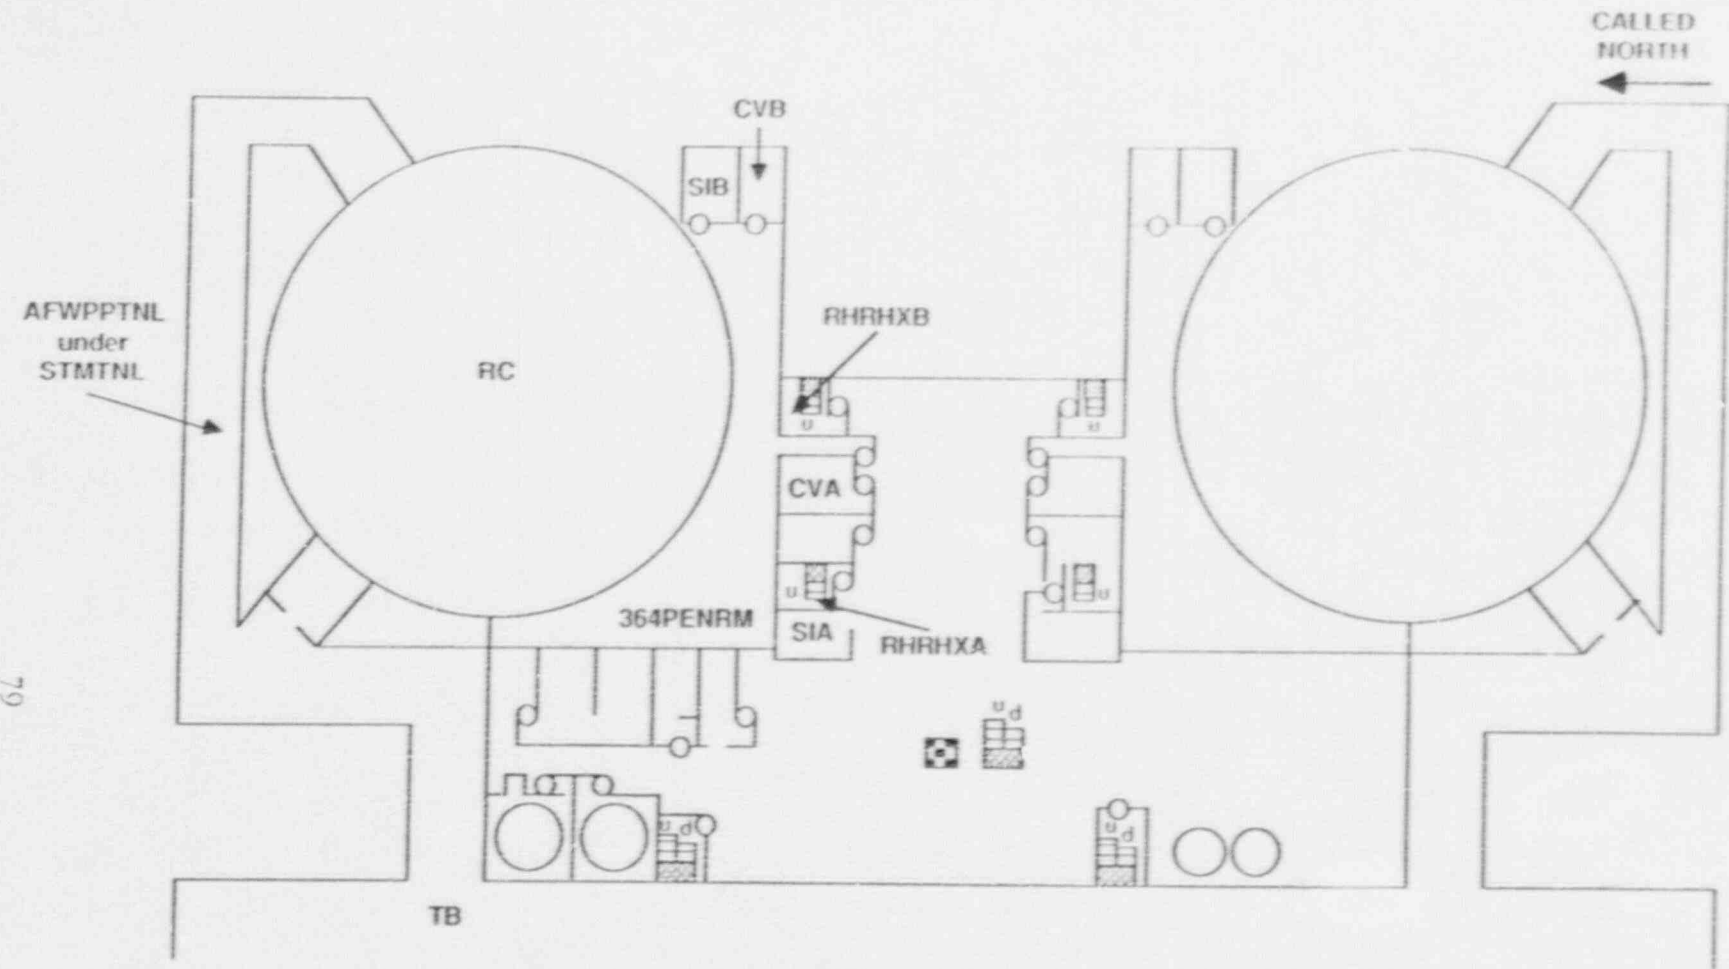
Braidwood 1 & 2 Station Arrangement, Elevation 346'
